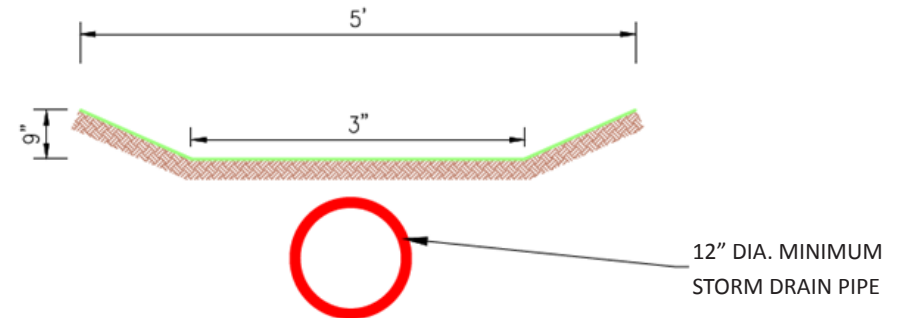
CROSS SECTION OF PLANTED SWALE
